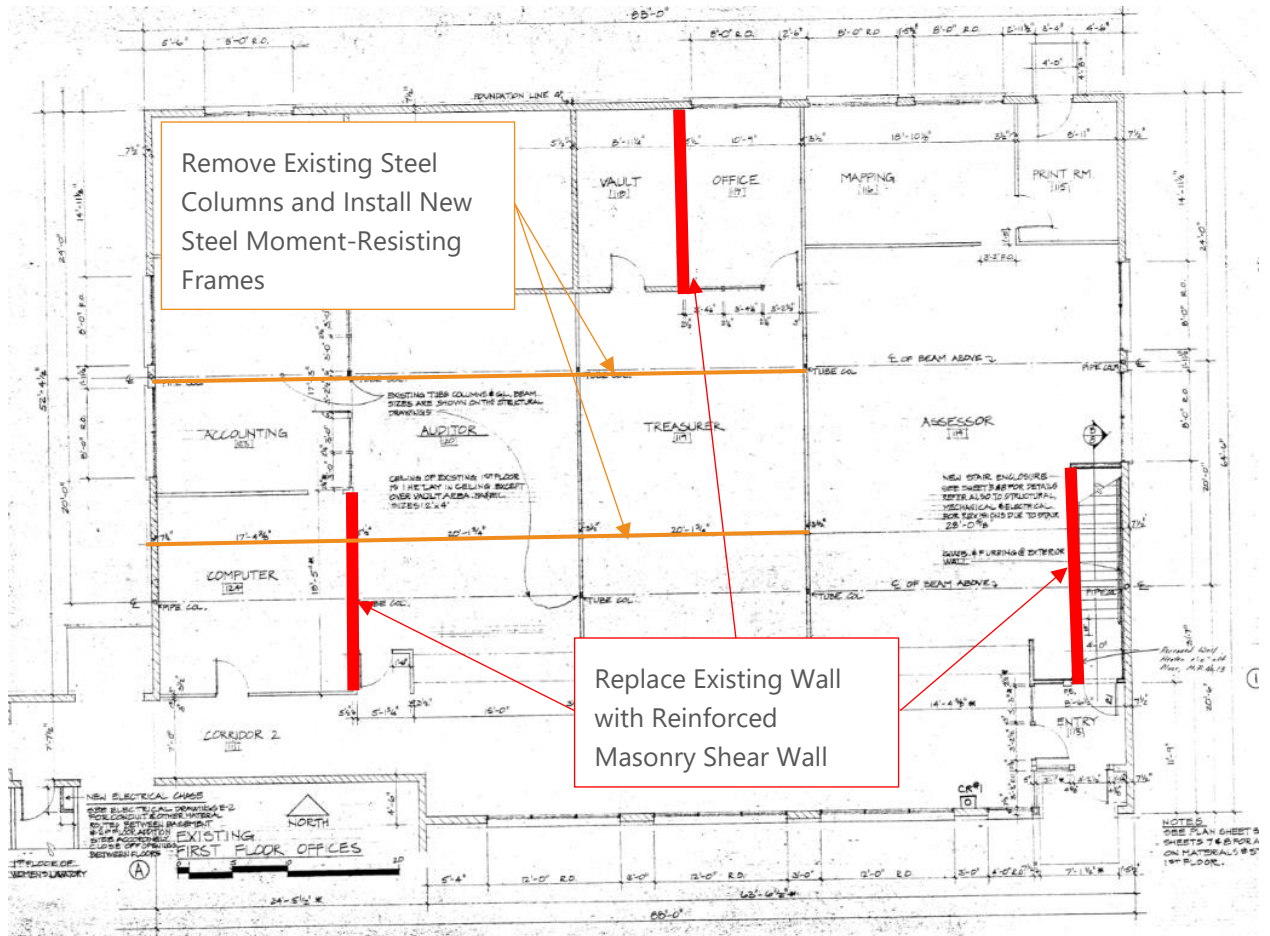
Proposed First Story Strengthening Concept for the 1980s Courthouse Addition
